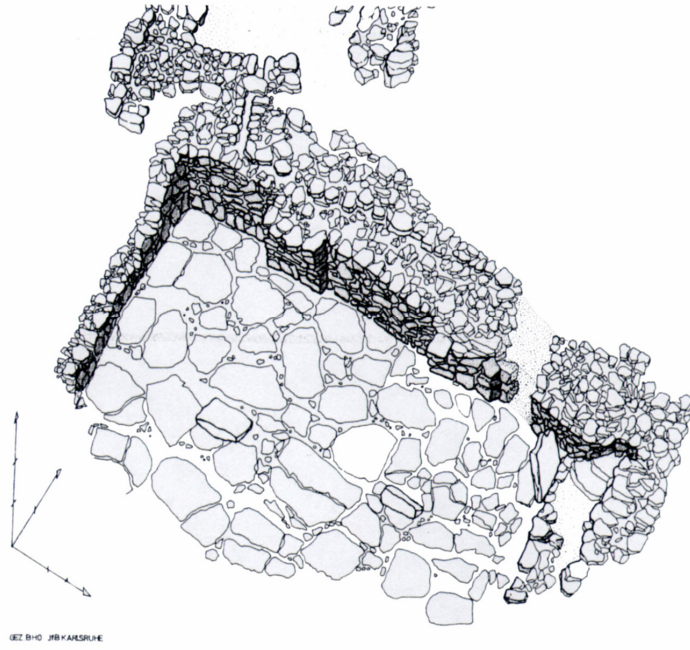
Çayönü. Isometric plan of Flagstone Building. (Schirmer 1983:474)
